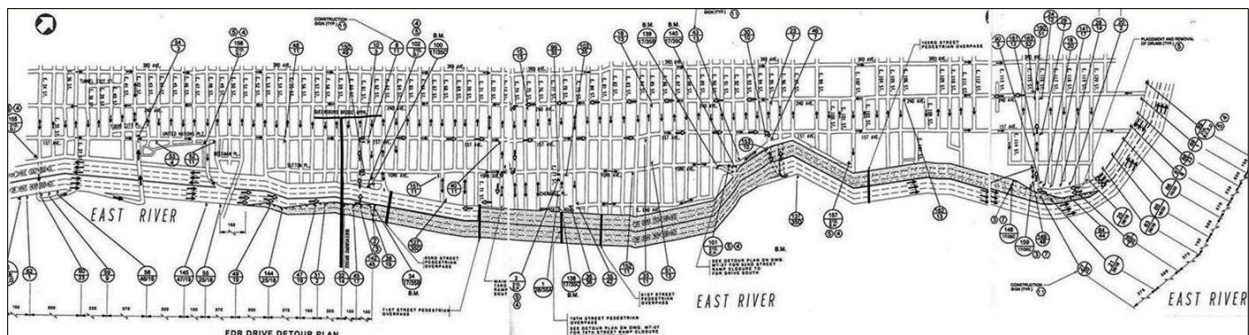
Detour plan during the closure of FDR Drive between East 42<sup>nd</sup> and East 116<sup>th</sup> Street.
